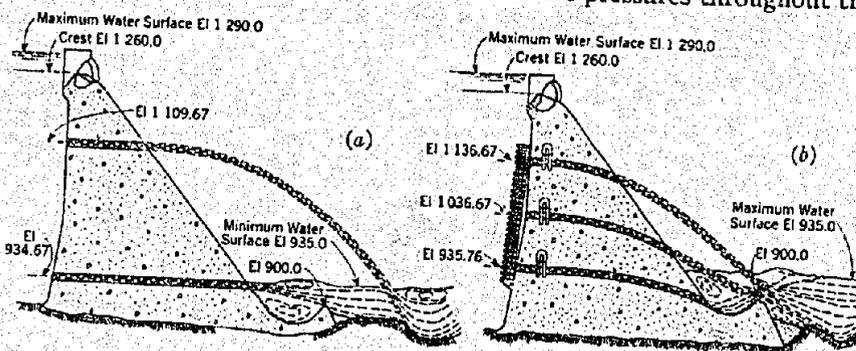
EARLY DESIGNS FOR GRAND COULEE OUTLETS
